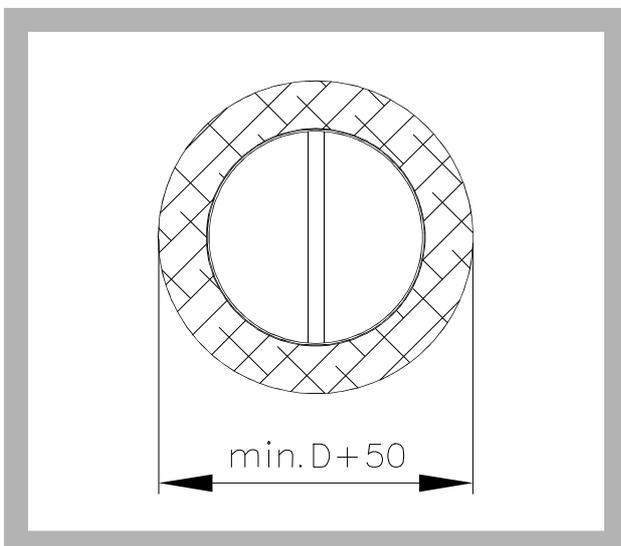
Installation opening - Space between damper and wall is filled by mineral stone wool and fire protection mastic
